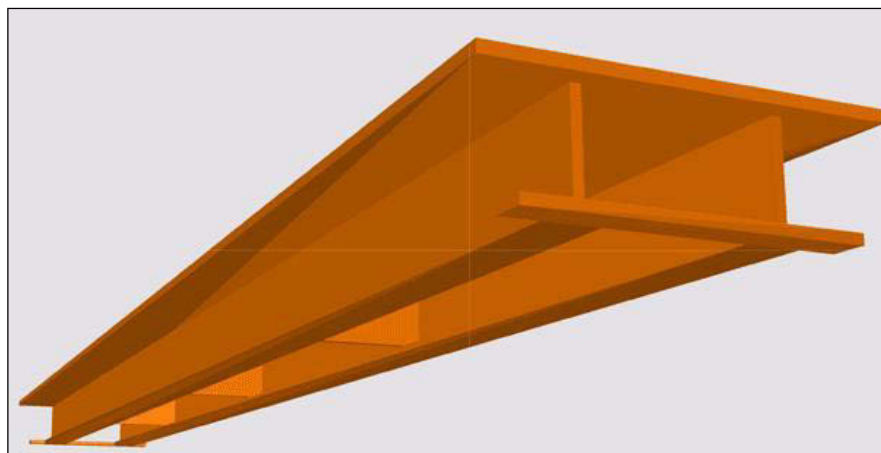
Potius floor system (Potius<sup>TM</sup> 2010)
